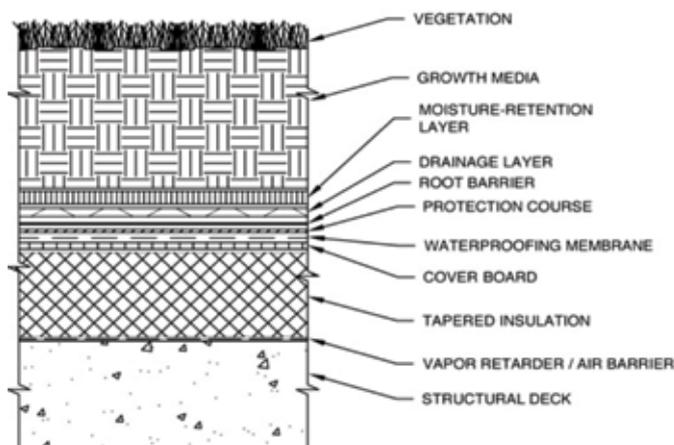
A conventional roof assembly adapted to a vegetative roof system
